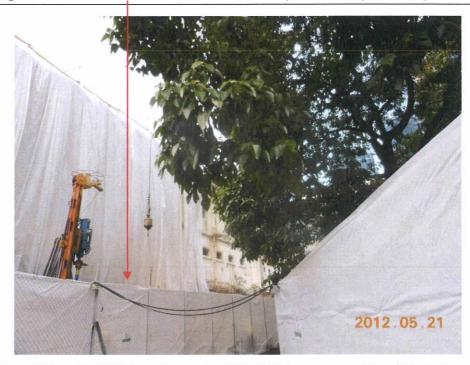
Some branches and leaves are too close to the wire-netted fence, we recommend to trim these branches and leaves.
